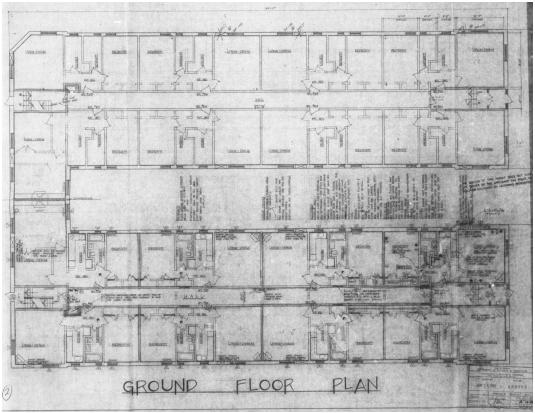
1982 Ground Floor Plan of 81 Isabella Street, which shows the layouts of the bachelor-sized apartment units. To the right of the plan, slightly larger garden suite units face the south side of the building (City of Toronto Building Records).
